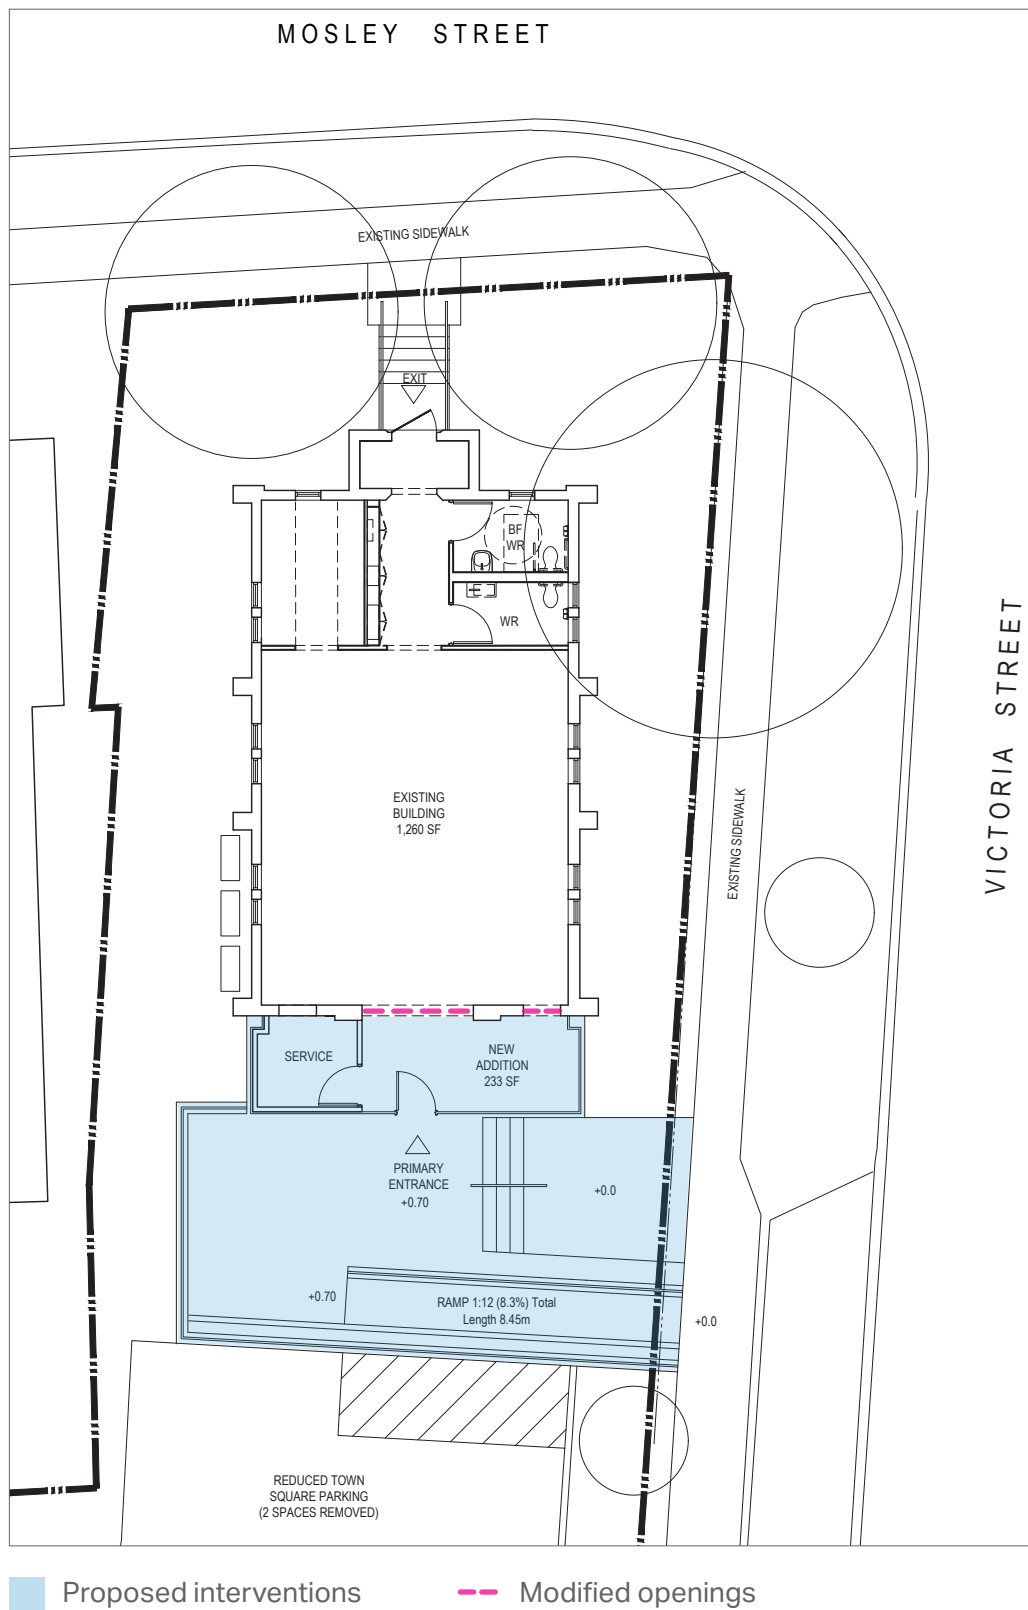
Proposed ground floor plan illustrating a new primary entrance addition, ramp and stairs at the south elevation, and the addition of two washrooms at the north end.
